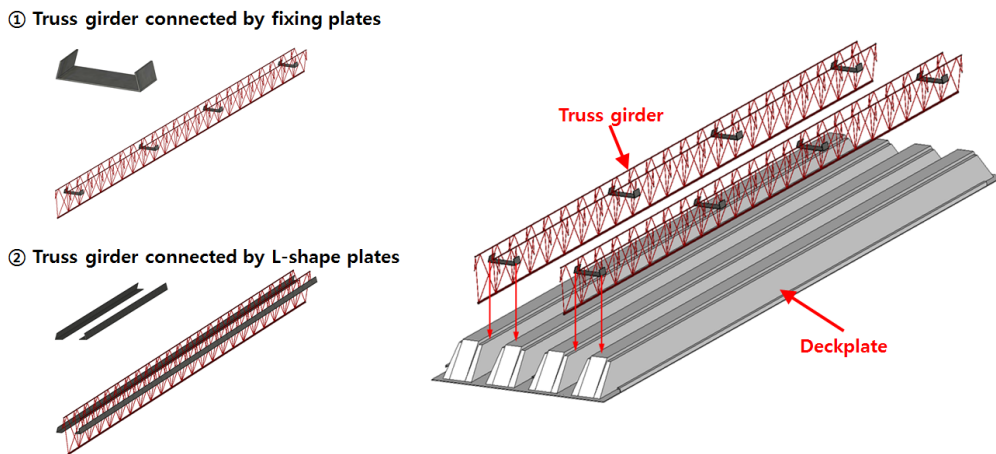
Main concept of the double rip deck system reinforced with inverted triangular truss girders
